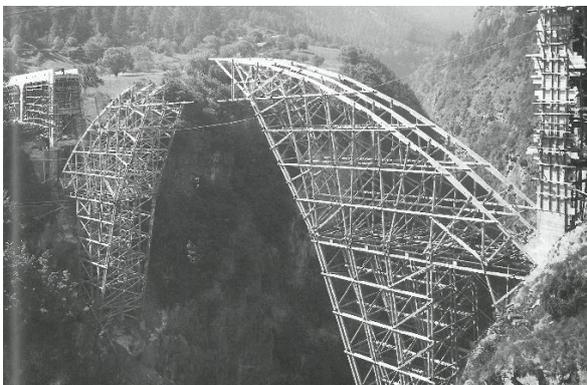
Renowned Salginatobelbrücke in Schiers, Graubünden, Eastern Switzerland by Robert Maillard (concrete structure) and Richard Coray (timber scaffolding) 1929-1930. These pictures highlight the transition of the role of timber in bridge constructions from being the dominant permanent solution in the past to serving as a temporary auxiliary construction. Pictures: L. Gianadda, R. Widmann
